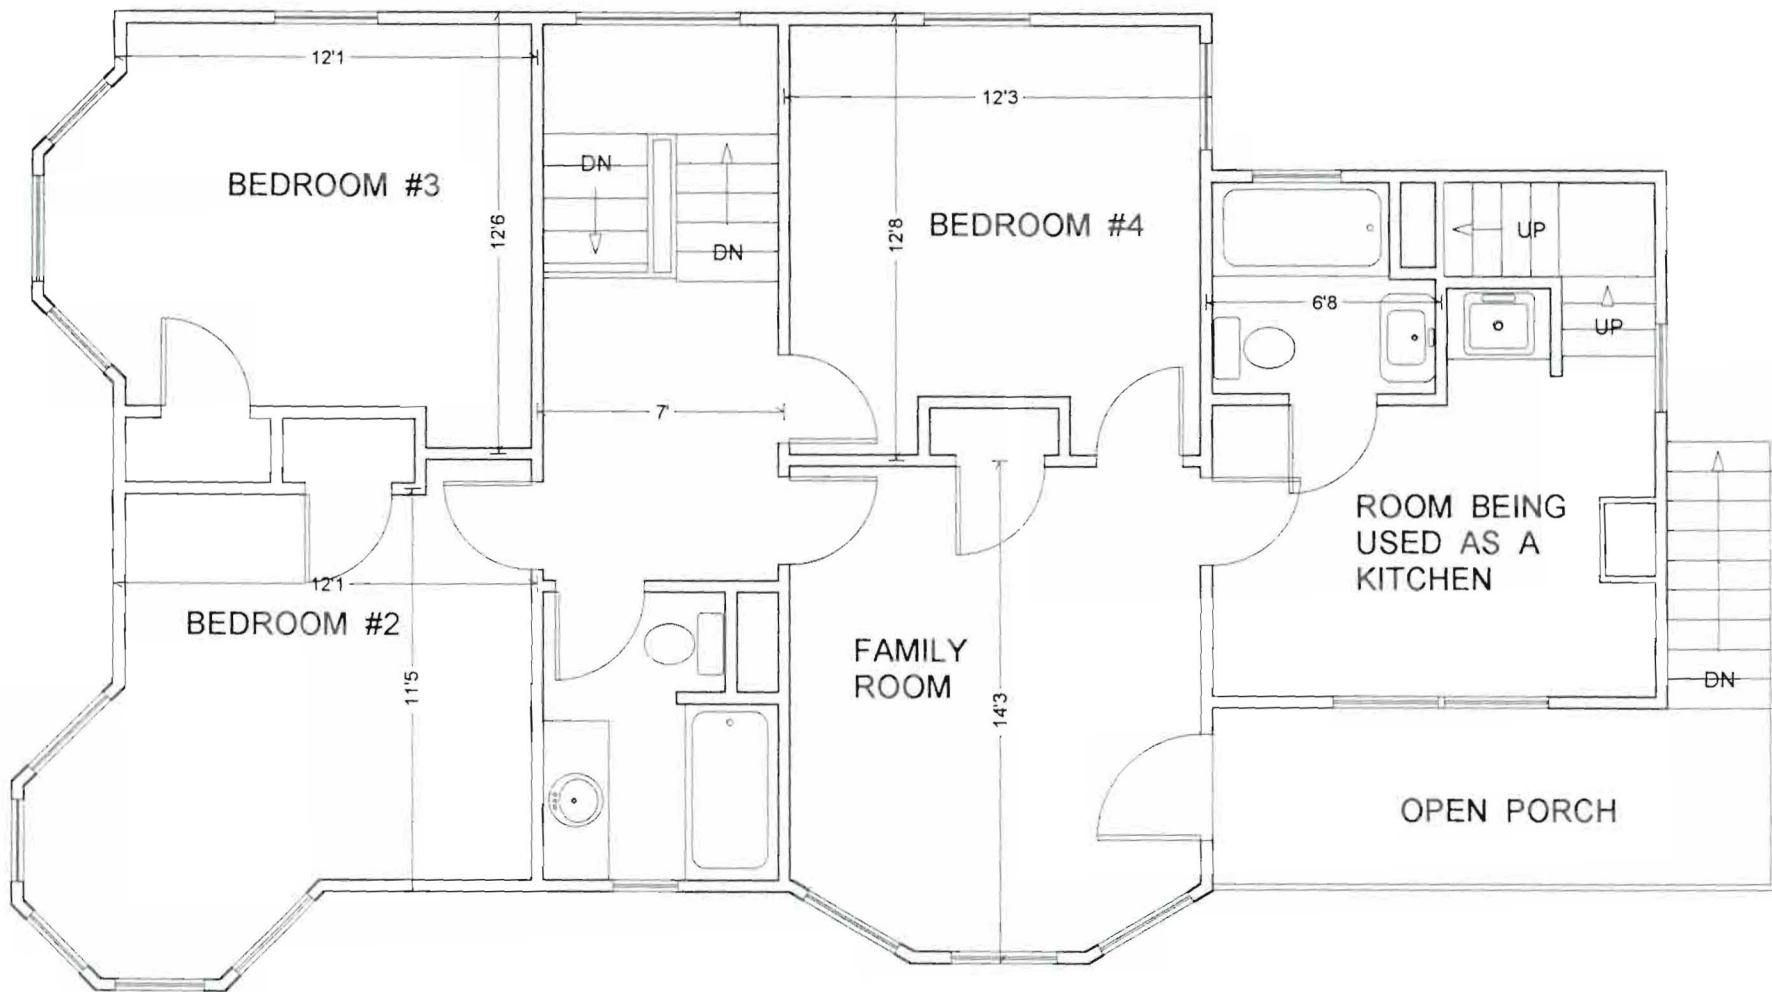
EXHIBIT "B" SECOND FLOOR PLAN "AS IS"
